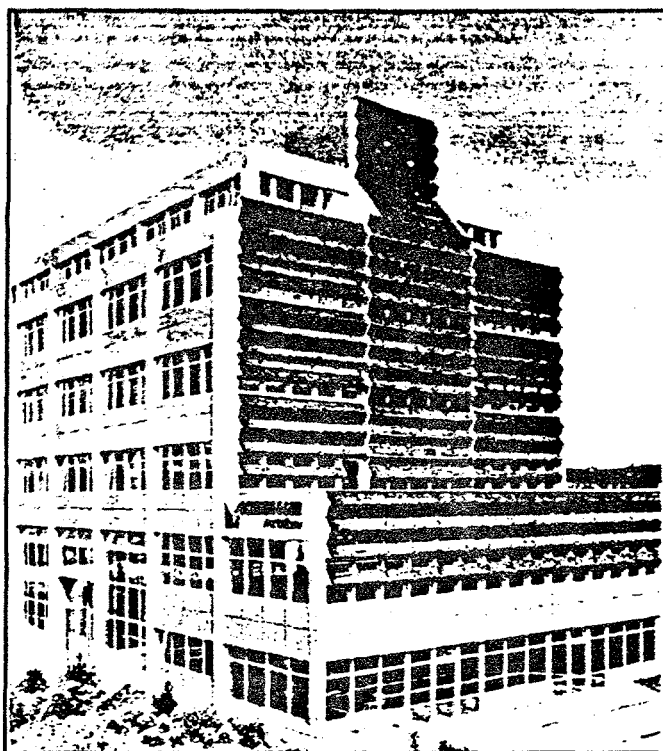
Swiss PV facade at Scheidegger Metallbau
